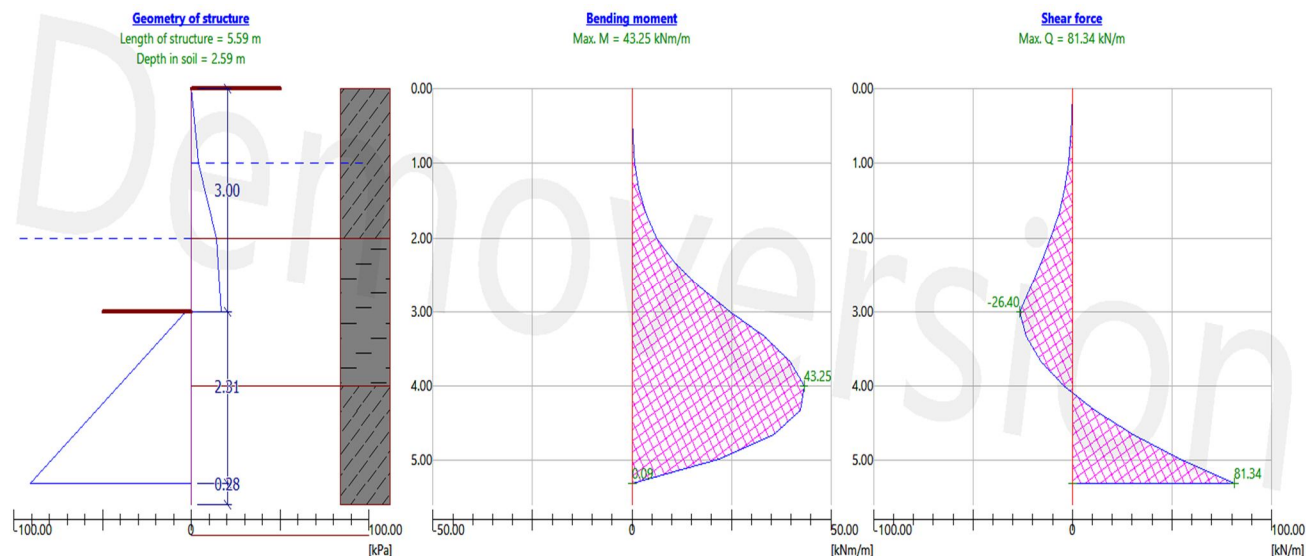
Model 4: U-section sheet pile wall for 3m depth of ditch in 2 layer soil
